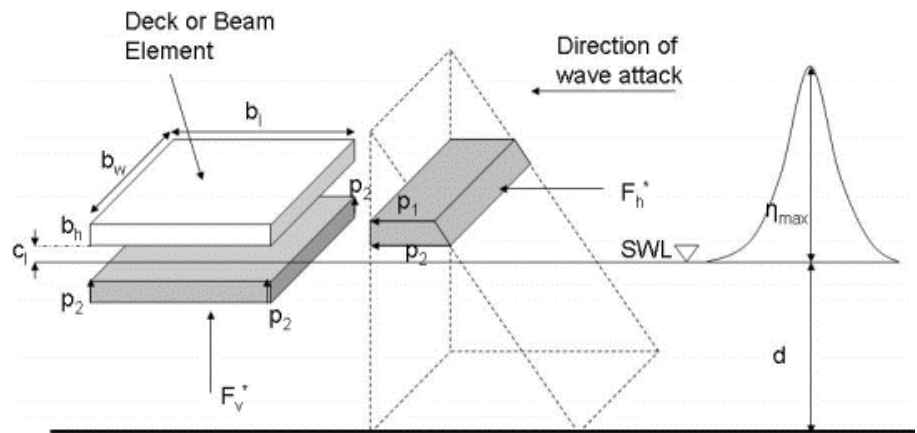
Schematic showing vertical (uplift) and horizontal forces applied to a deck or beam element
